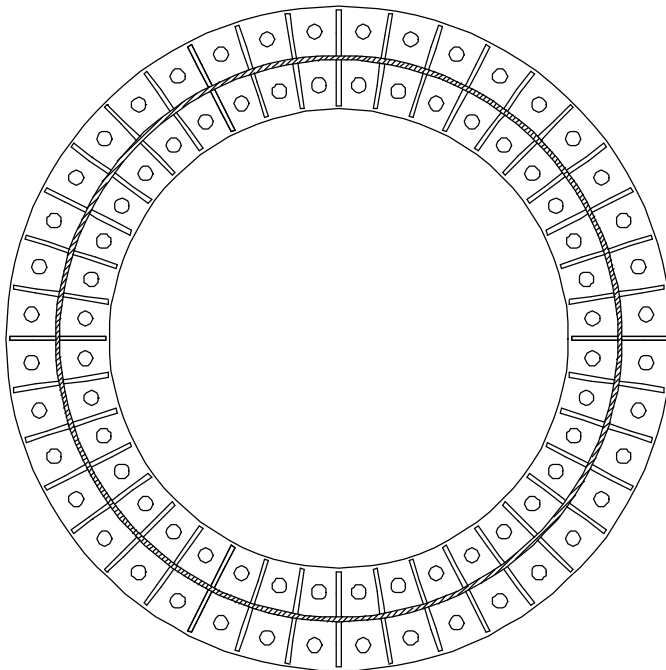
c Base plate with 2 x 40 foundation gusset plates and 2 x 40 bolt holes.
